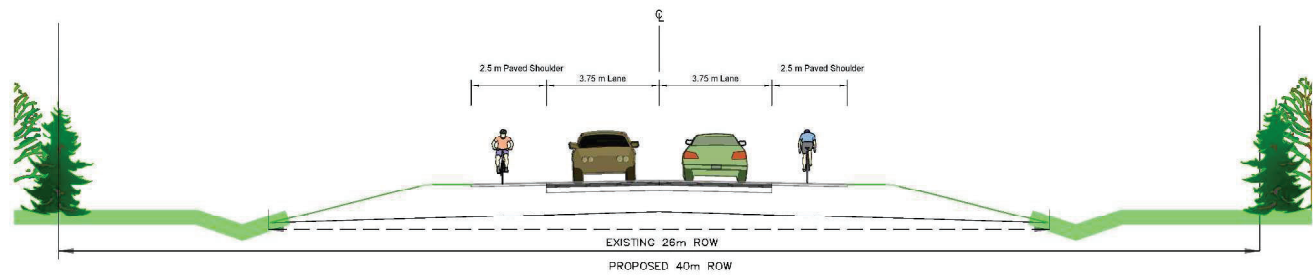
Section 3 Alternative 1 - 2-Lane Rural Cross Section
